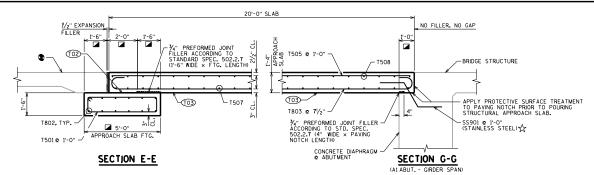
DETAILS FOR WINGS PARALLEL TO A1 ABUTMENT CENTERLINE BUREAU OF
